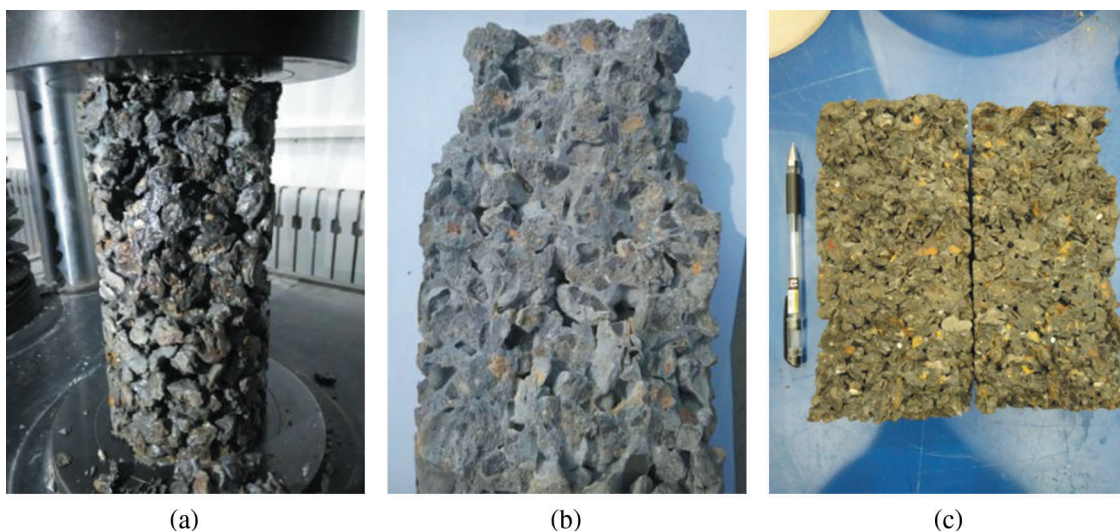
Compression and splitting failure of specimens. (a) Compressive strength test, (b) Compression failure of specimens, (c) splitting failure of specimens
